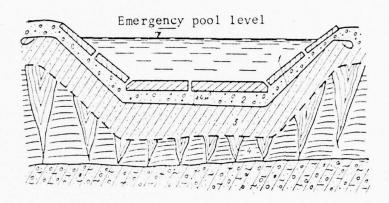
Thaw protection of the icy foundation of a bypass spillway. (1) Film lining; (2) protective and drainage layer from gravel and shingle; (3) heat-shielding layer from non-heaving soil; (4) icy foundation soil.
